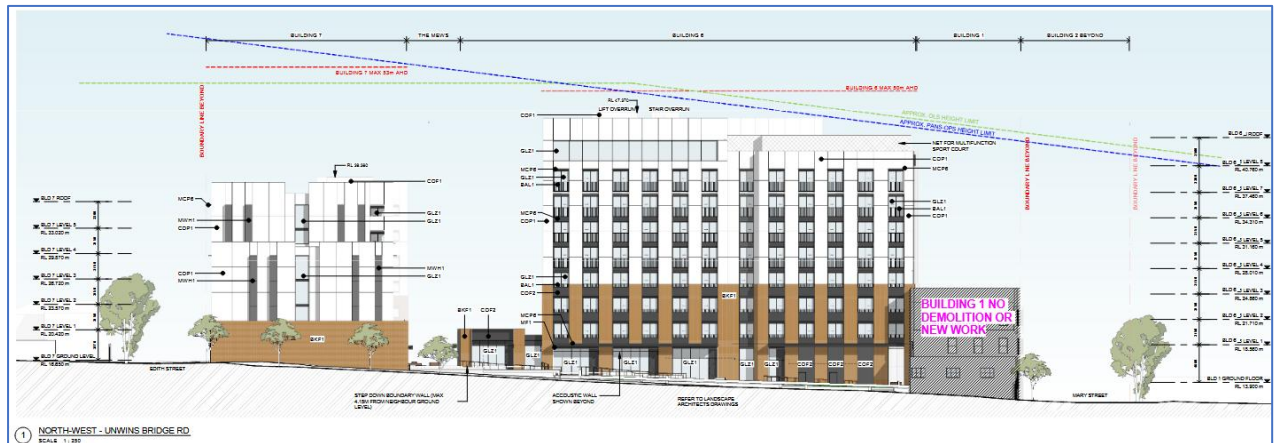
Drawing DA-30-02 North-West Elevations Rev 8, SSD-82639959, Proposed Design - Building 1 at the centre, renamed Building 6
